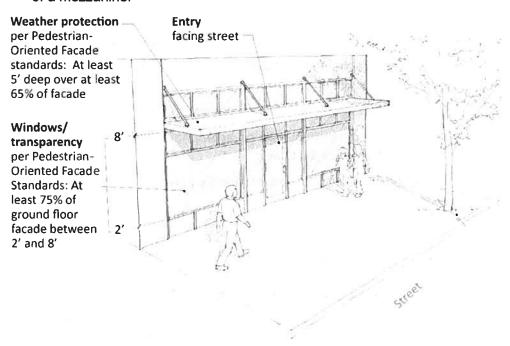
a. An example of a pedestrian-oriented façade.
